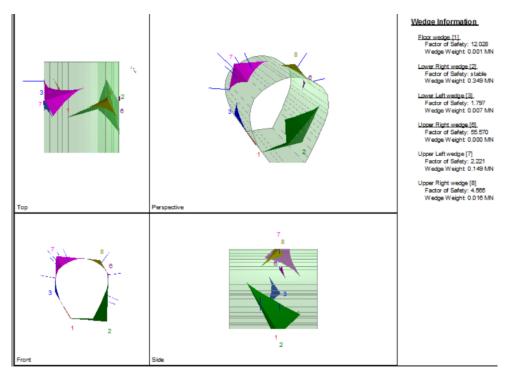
The stabilized wedge after providing the required support pressure (A-B Segment)
